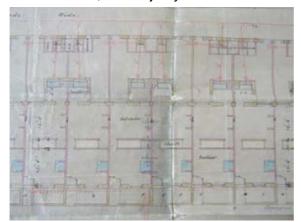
Plan of houses on Bold Street from Borough building plans, 1888
